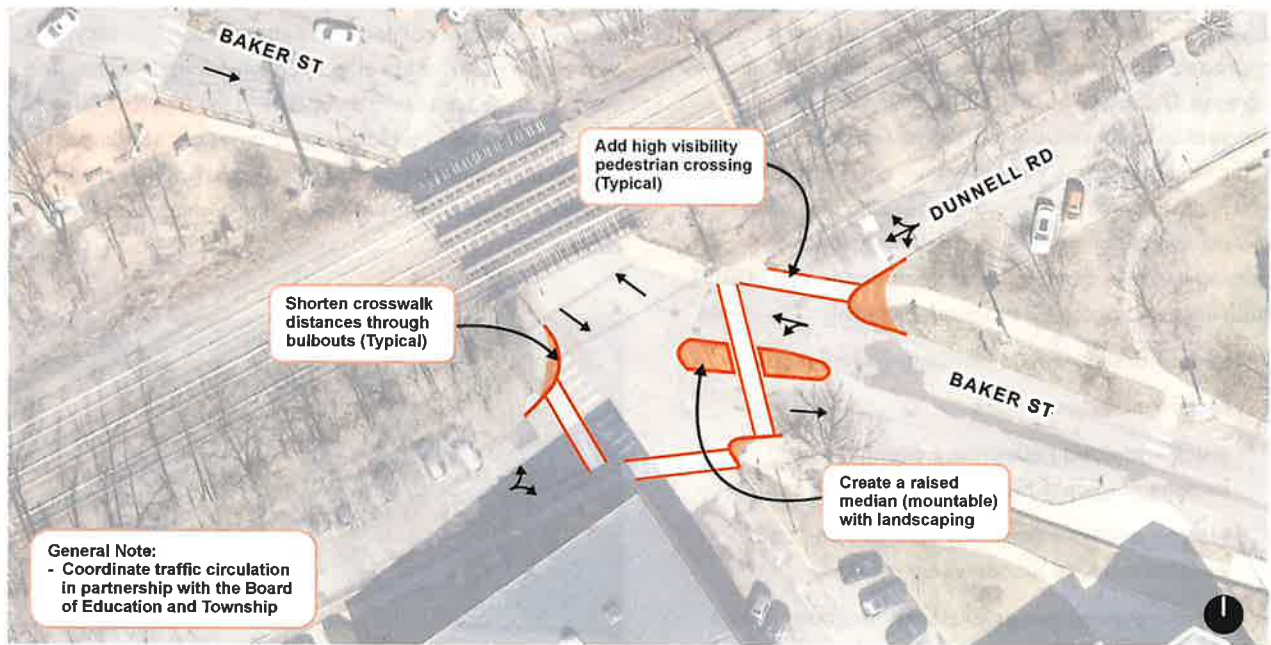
Conceptual Plan for the Intersection at Baker Street and Dunnell Road
